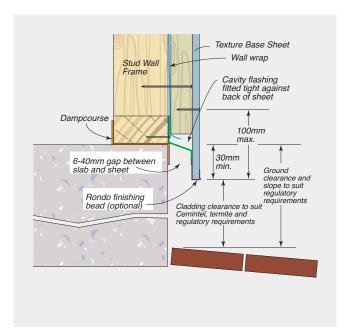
Base Detail - Frame Set-back from Concrete Slab Edge
